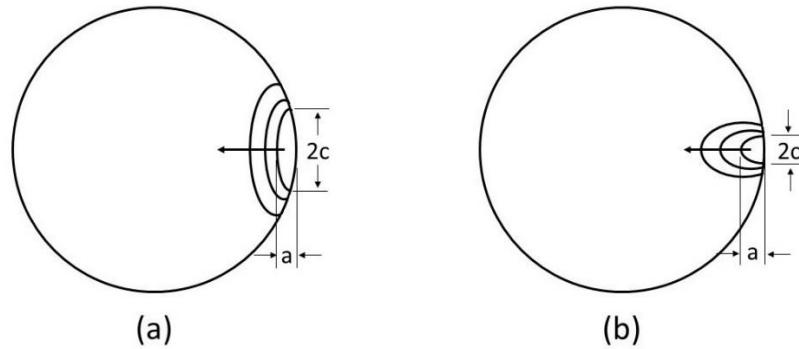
Crack shape (a) and pit shape (b) occurring on rebar.
